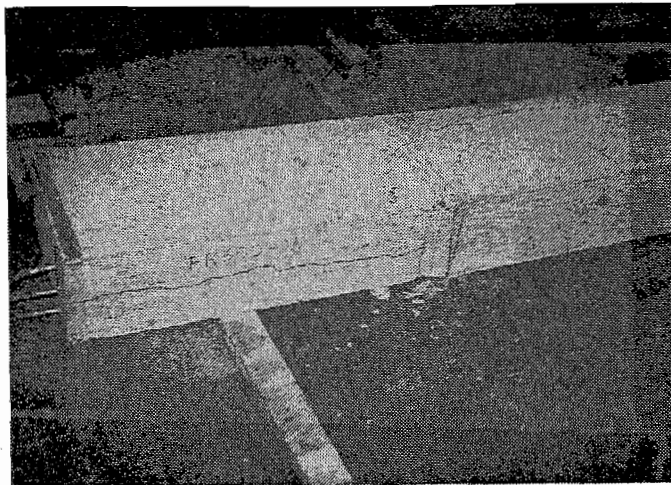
Photograph of Cracking at Failure Beam FR350-1 Test A: Bond Failure
